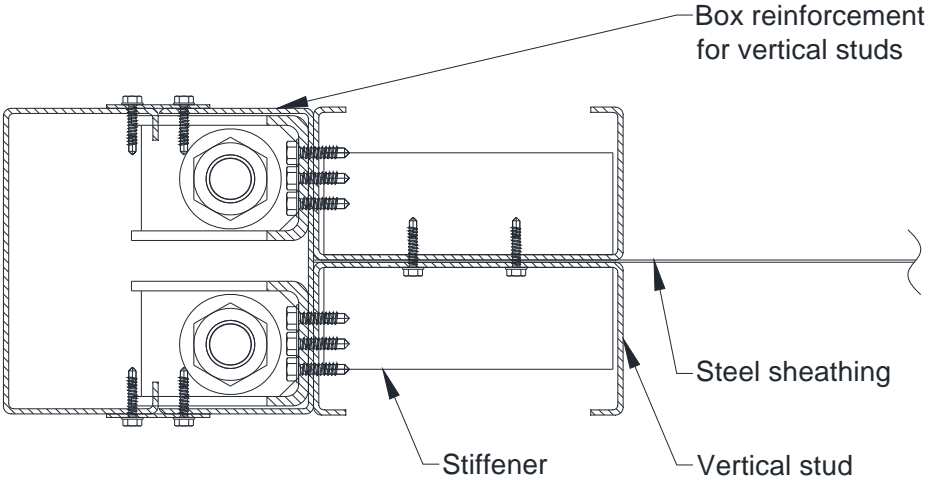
Final centre-sheathed configuration: cross-section of a chord stud and its reinforcement
